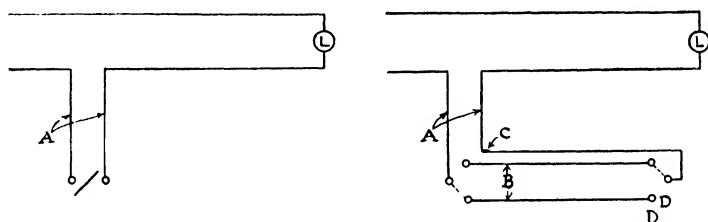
Connections for installation of two-way switches as a substitute for an old one-way switch
